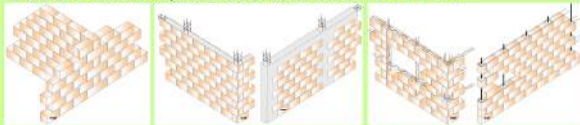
Scheme of Structures system in study: Simple masonry, confined masonry and reinforced masonry with prefabricated bed joint reinforcement or reinforcing steel bars with concrete infill
